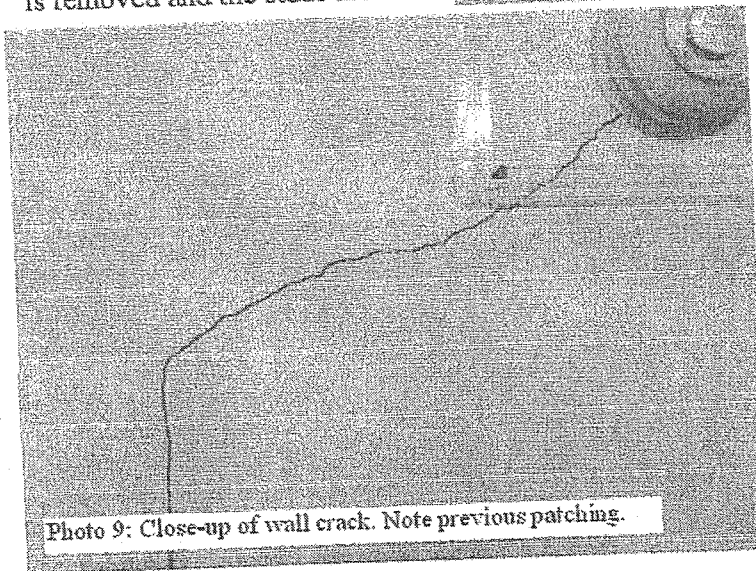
Close-up of wall crack. Note previous patching.
